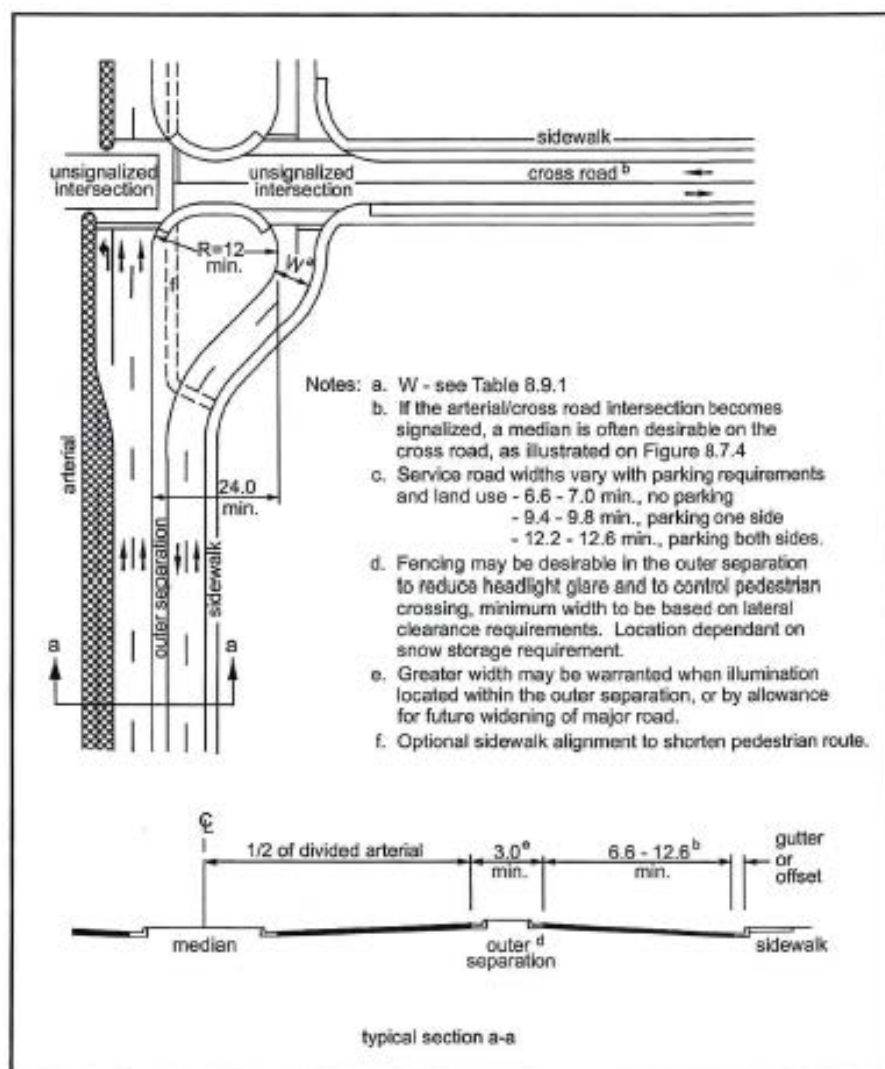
Two-Way Service Road / Cross Road Intersection Treatment, Cross Road Volumes ≤ 2000 veh/d, Unsignalized Intersection
